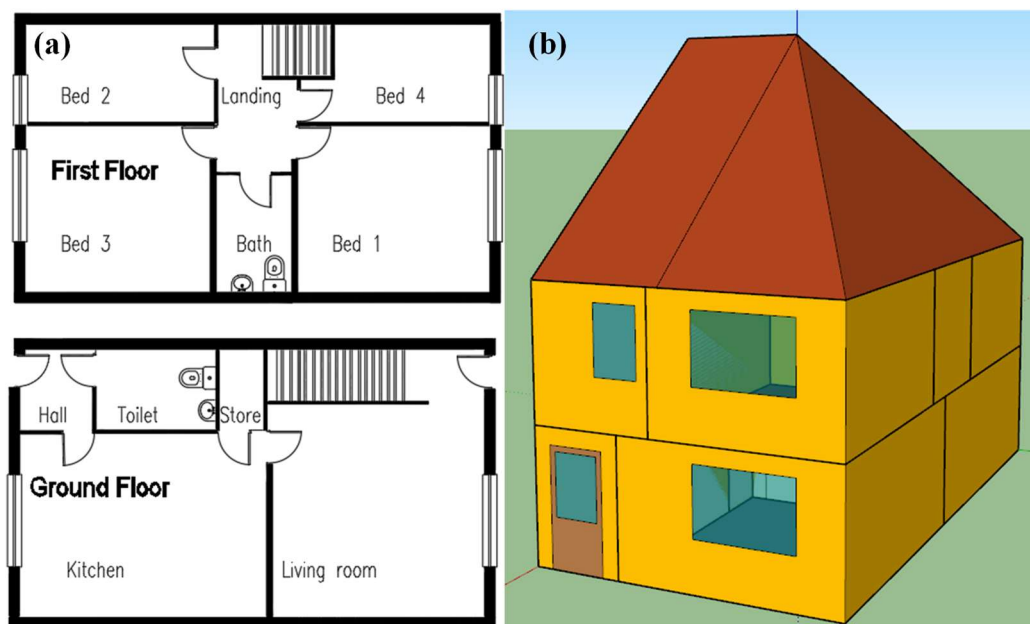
(a) Floor plan of the studied semi-detached four-bedroom house, (b) 3D model of the dwelling
